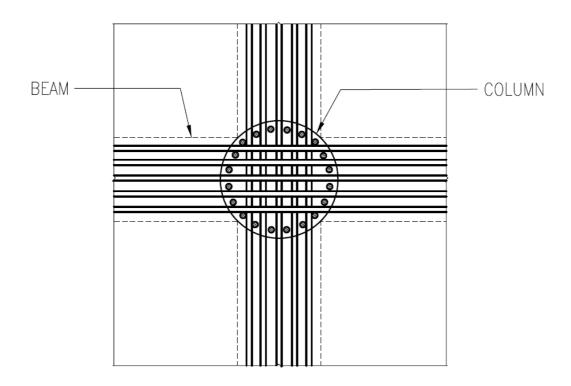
Longitudinal bars of beams slotted into congested column cages to be avoided
